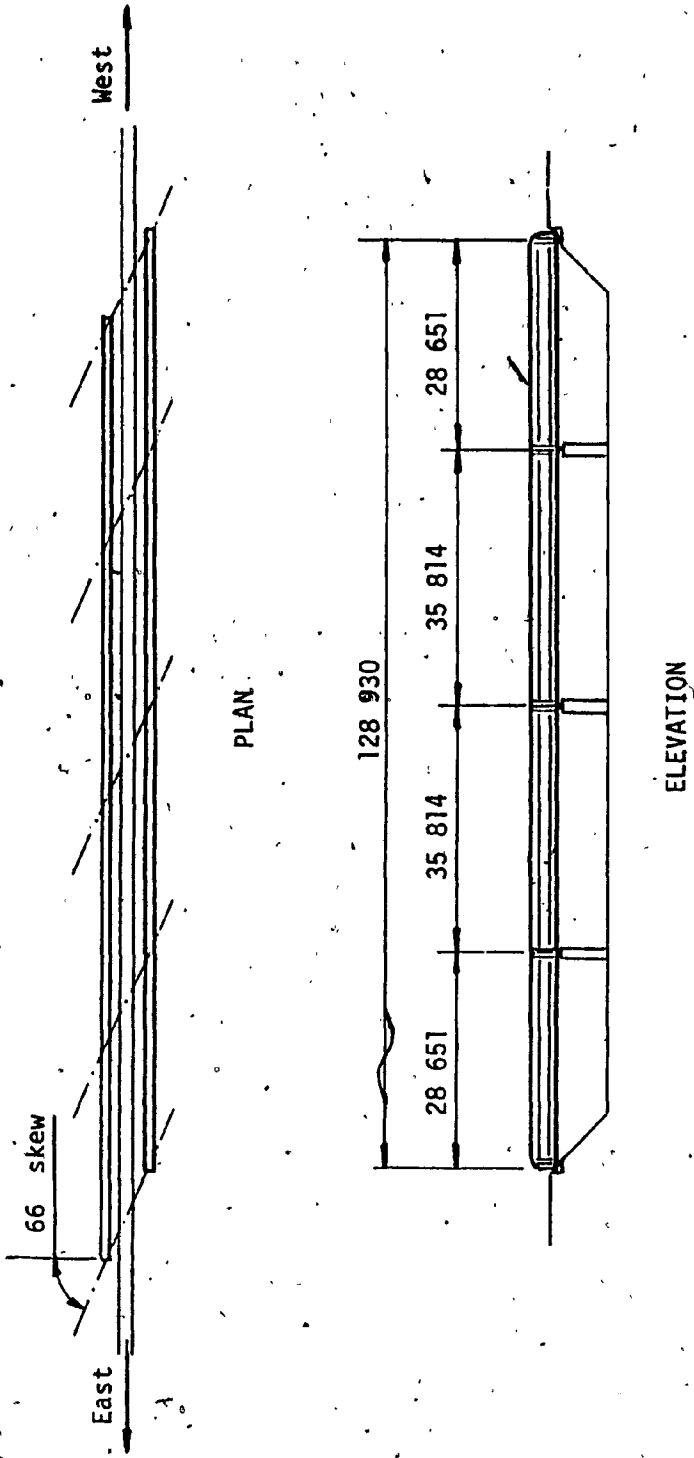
BRIDGE 8.75 - PLAN and ELEVATION
